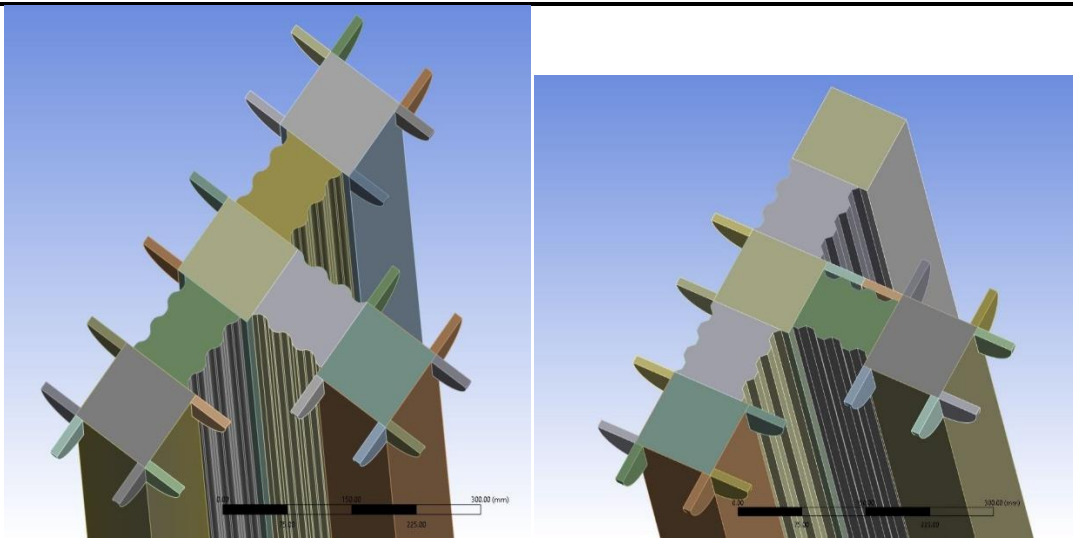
T-shaped CFST Column with trapezoidal Sinusoidal Corrugated Steel Plates
